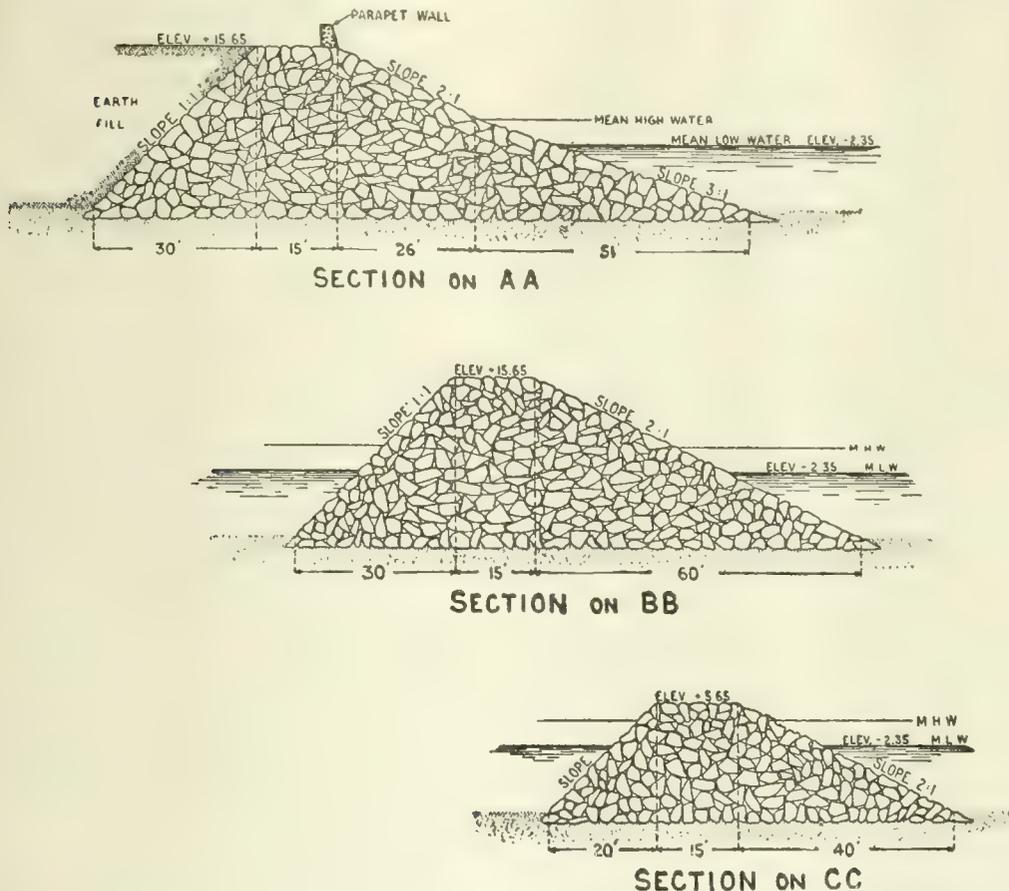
Sections of Retaining Walls for the New York Artificial Sewage Disposal Island. Sections Indicated on Fig. 2.
